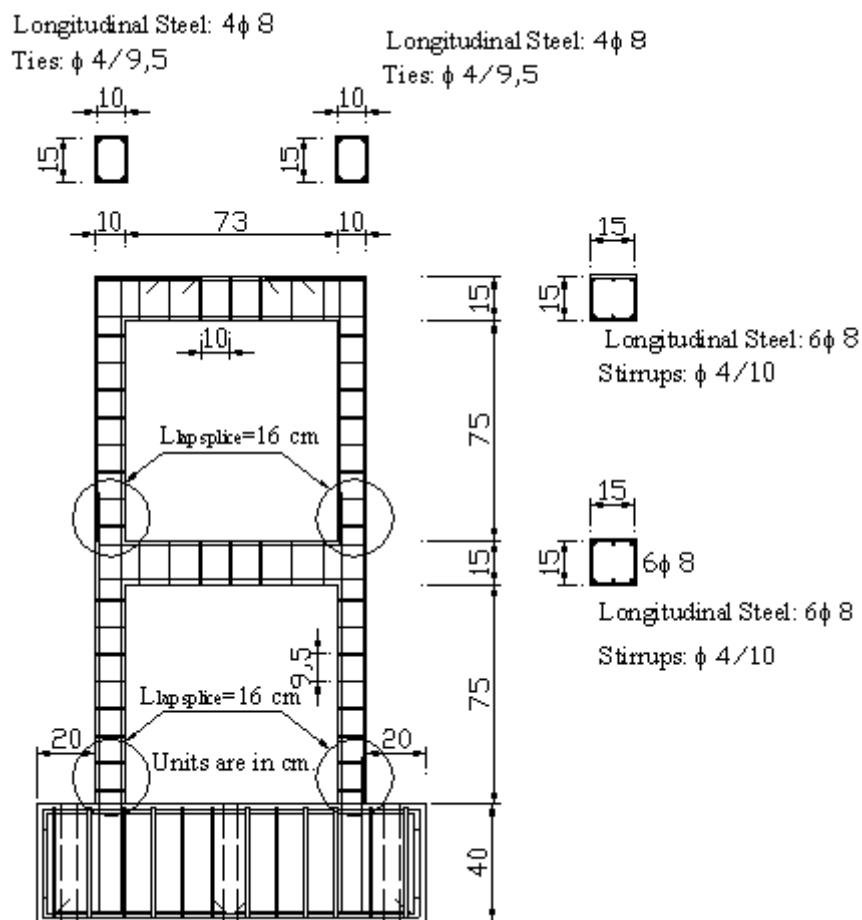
Reinforcement detail of the specimens with an aspect ratio of 1.0
